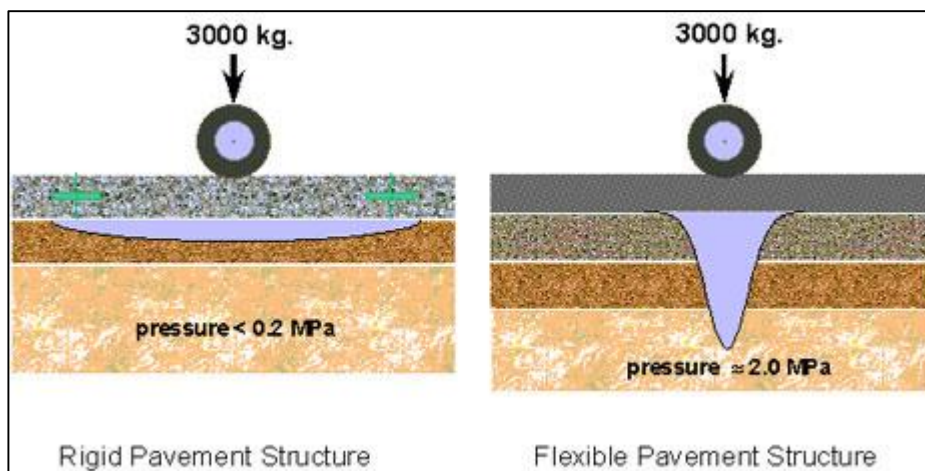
Typical Load Distribution For Flexible and Rigid Pavement Layers (Concrete, 2016)
